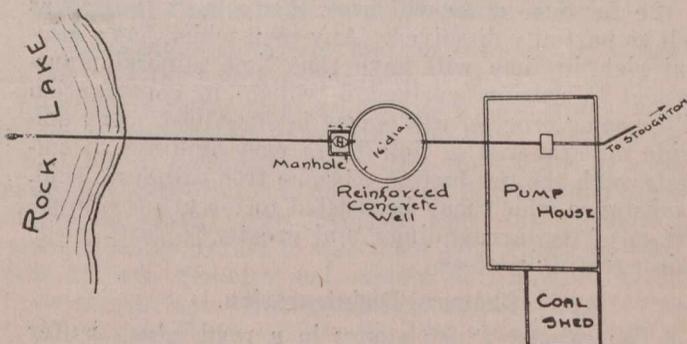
Plan of Intake and Pumping Plant, Rock Lake.
